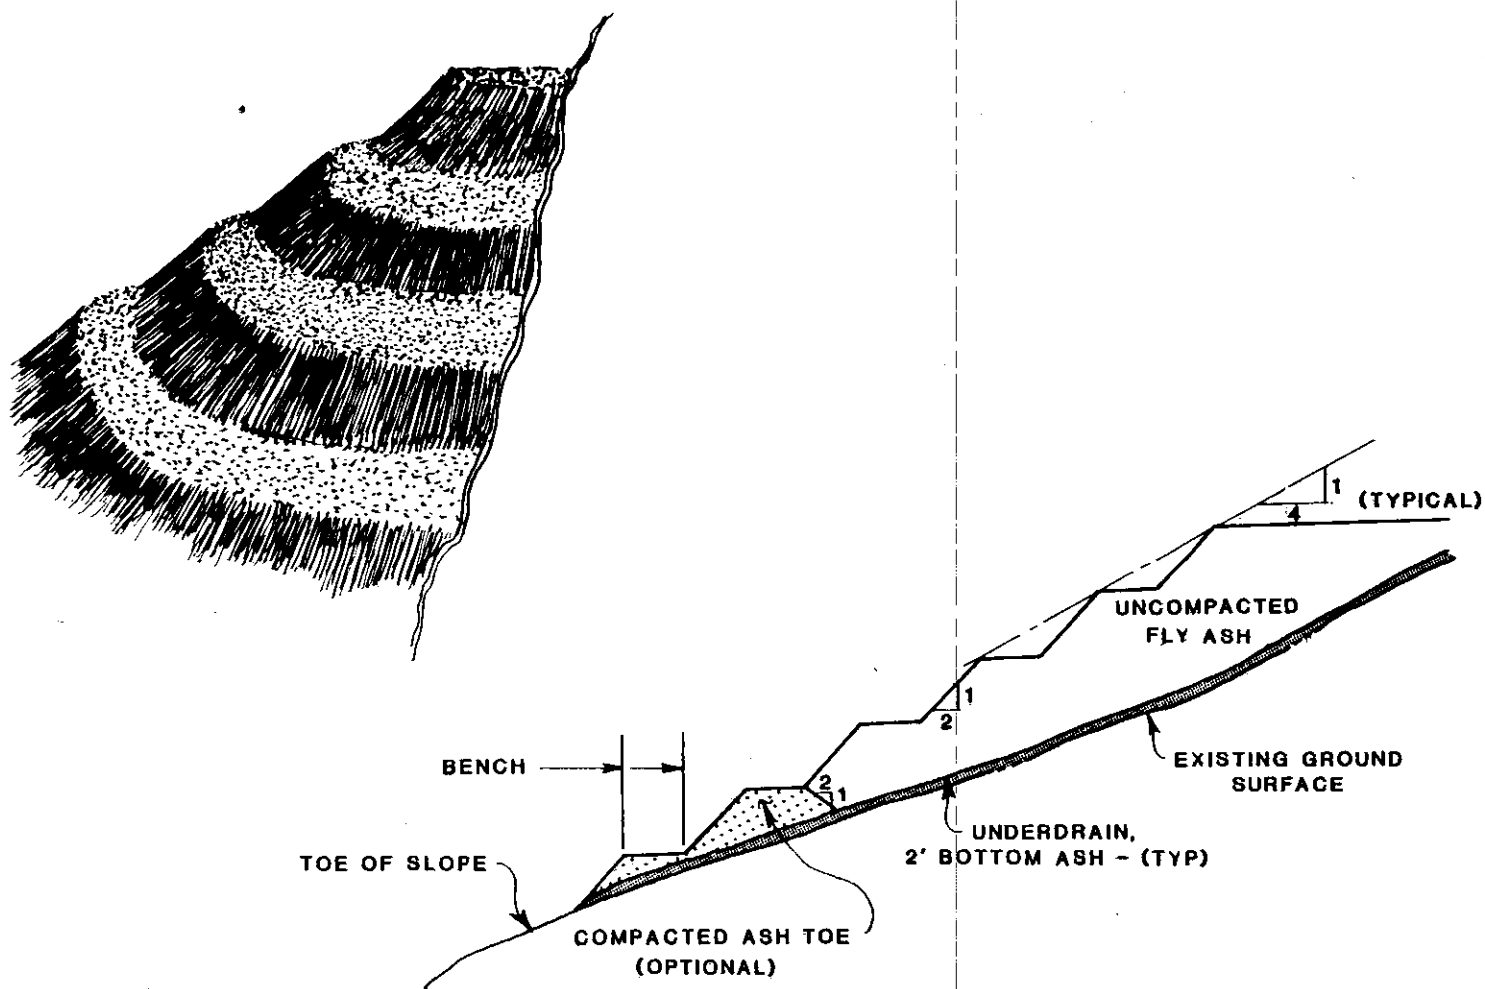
Cross-Section: Dry Ash Disposal Area
